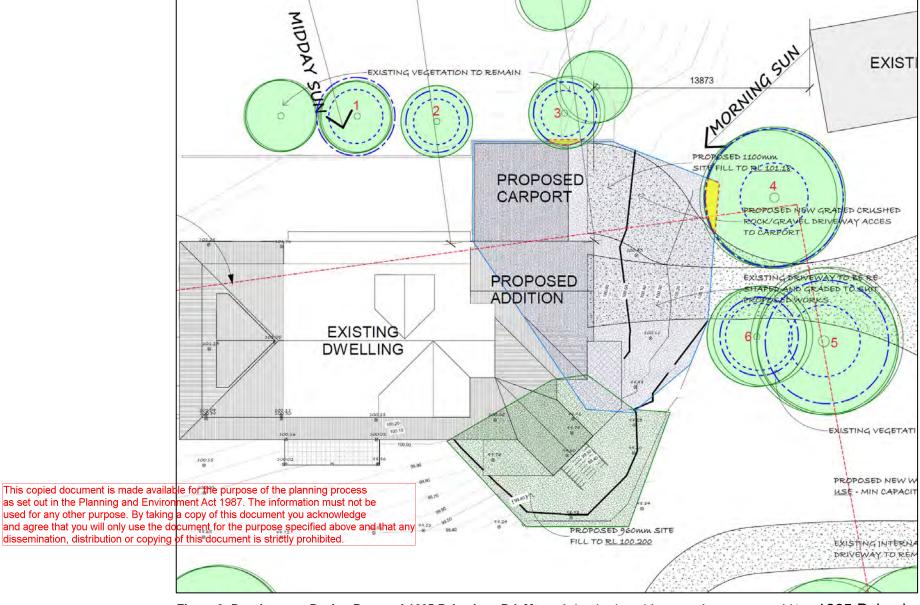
Development Design Proposal 1265 Pakenham Rd, Mt Burnett. Encroachments highlighted on the Site Plan.
